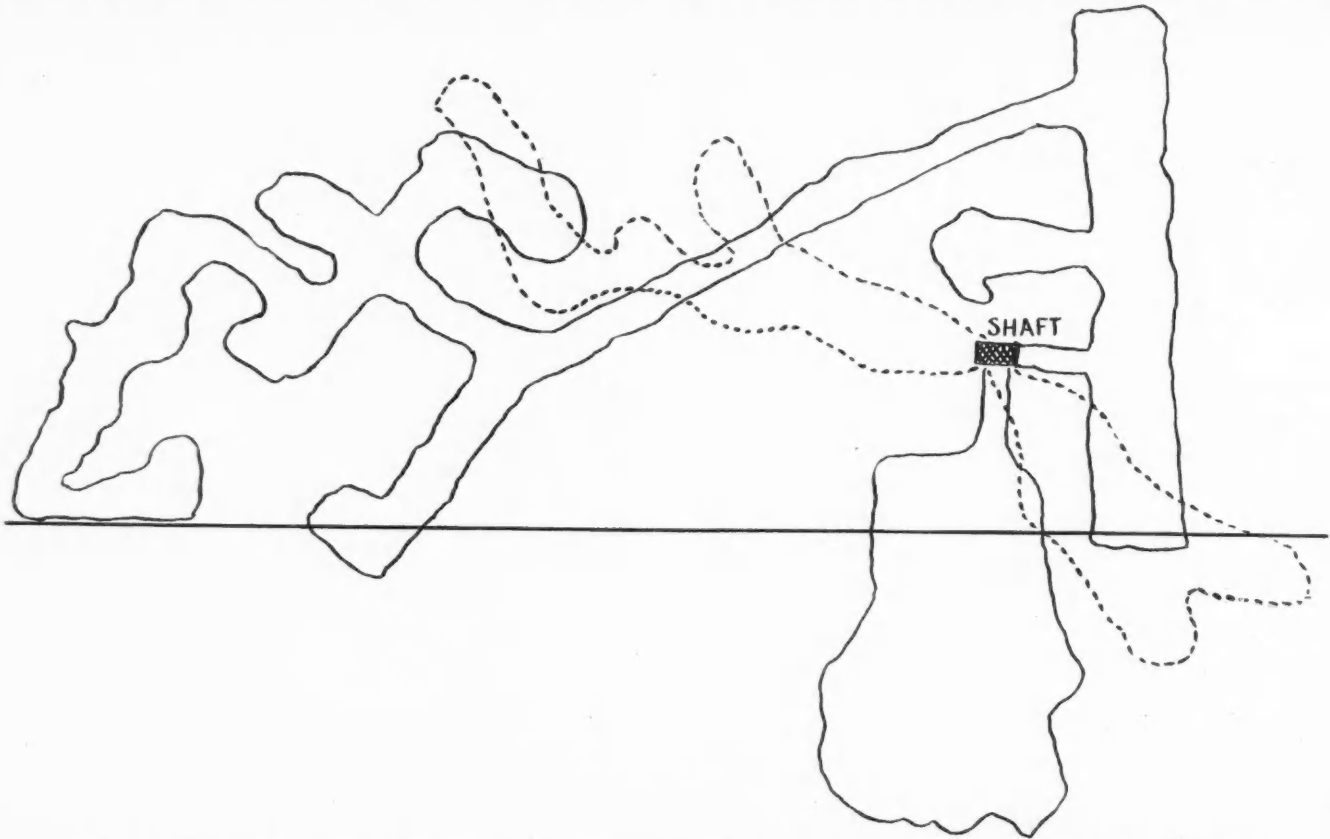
SCALE 40 FT. = 1 IN. PLAN OF UNDERGROUND WORKINGS IN HARD GROUND. GALENA-JOPLIN DISTRICT, MISSOURI.
